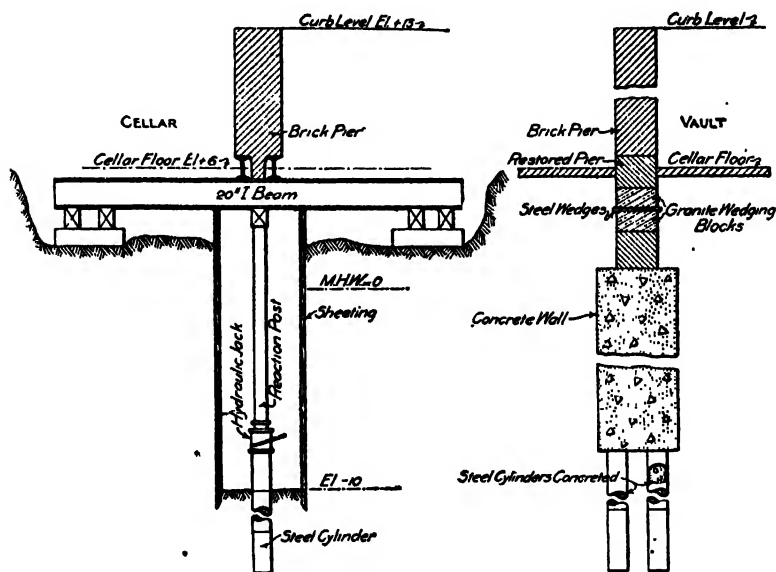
Method of Underpinning Centre Street Buildings, New York, Due to Subway Excavations.
